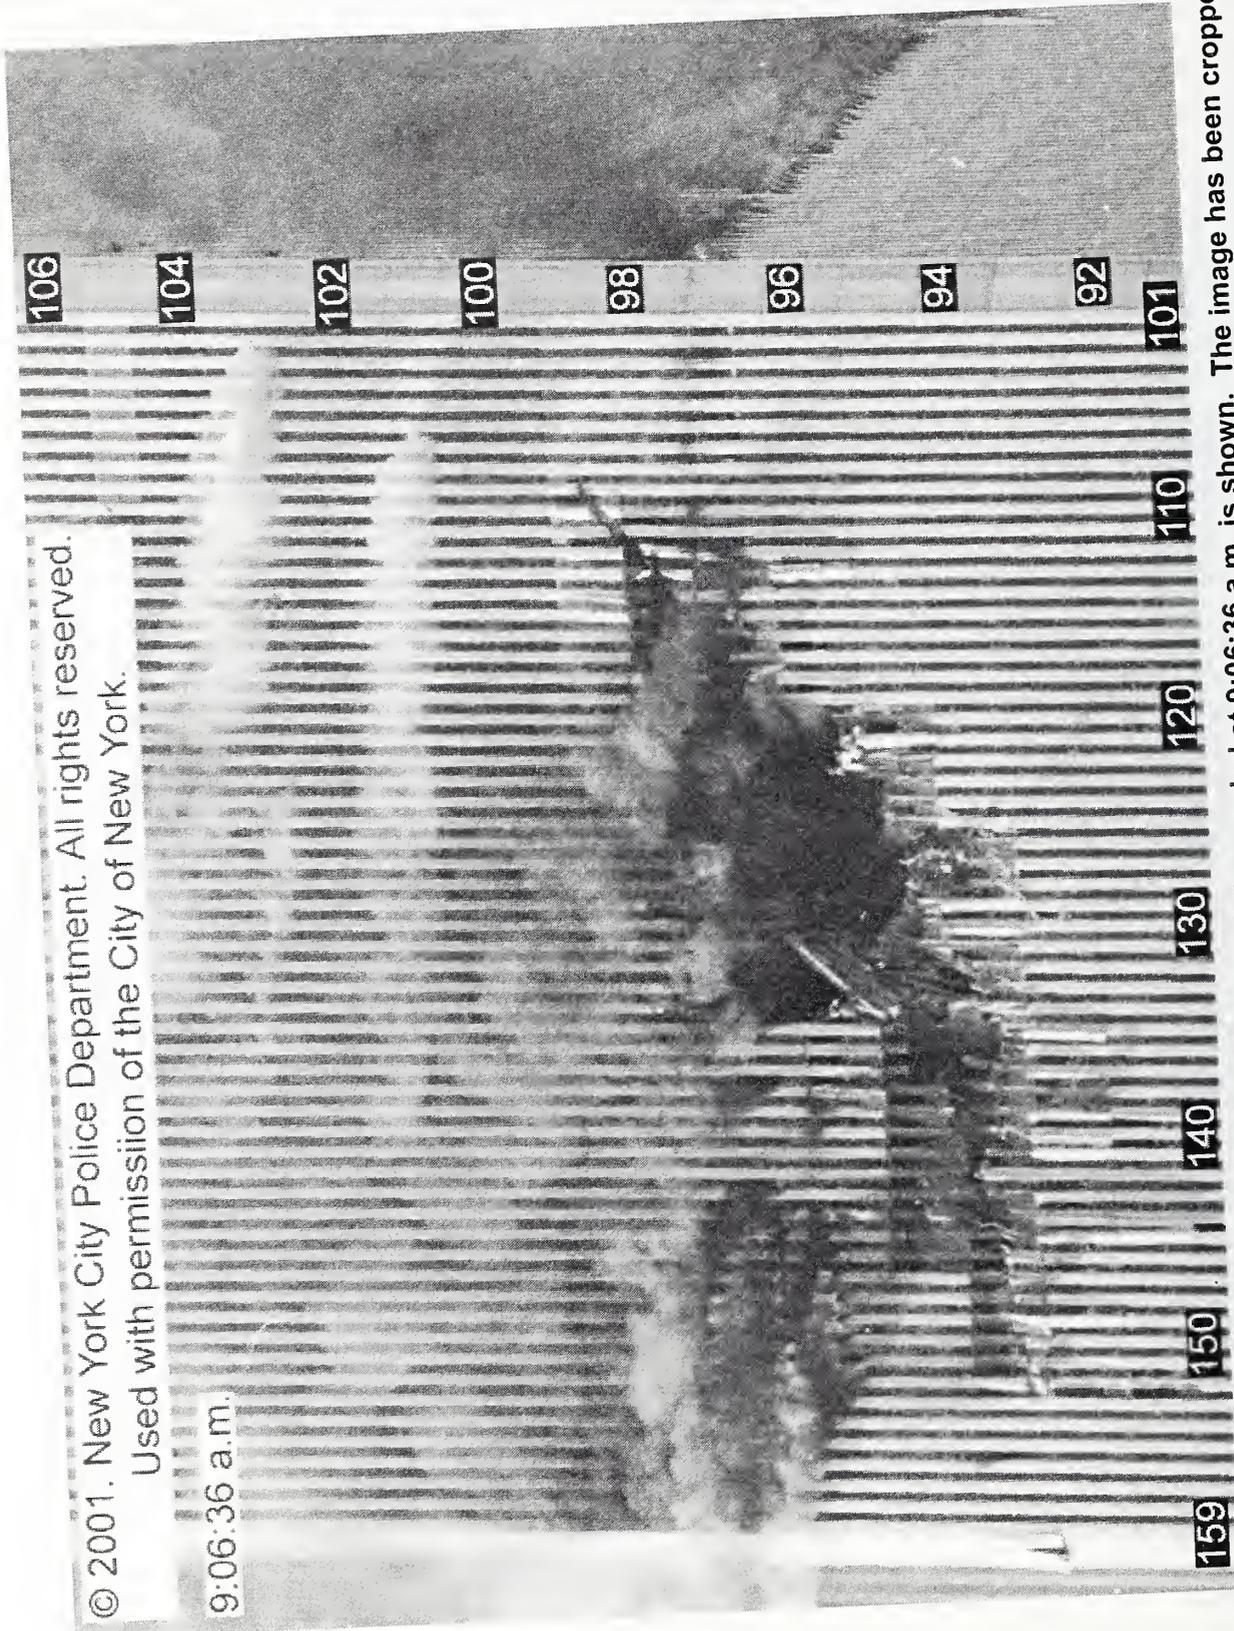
A photograph of the north face of WTC 1 recorded at 9:06:36 a.m. is shown. The image has been cropped, rotated, and enhanced. Column and floor numbers have been added.
